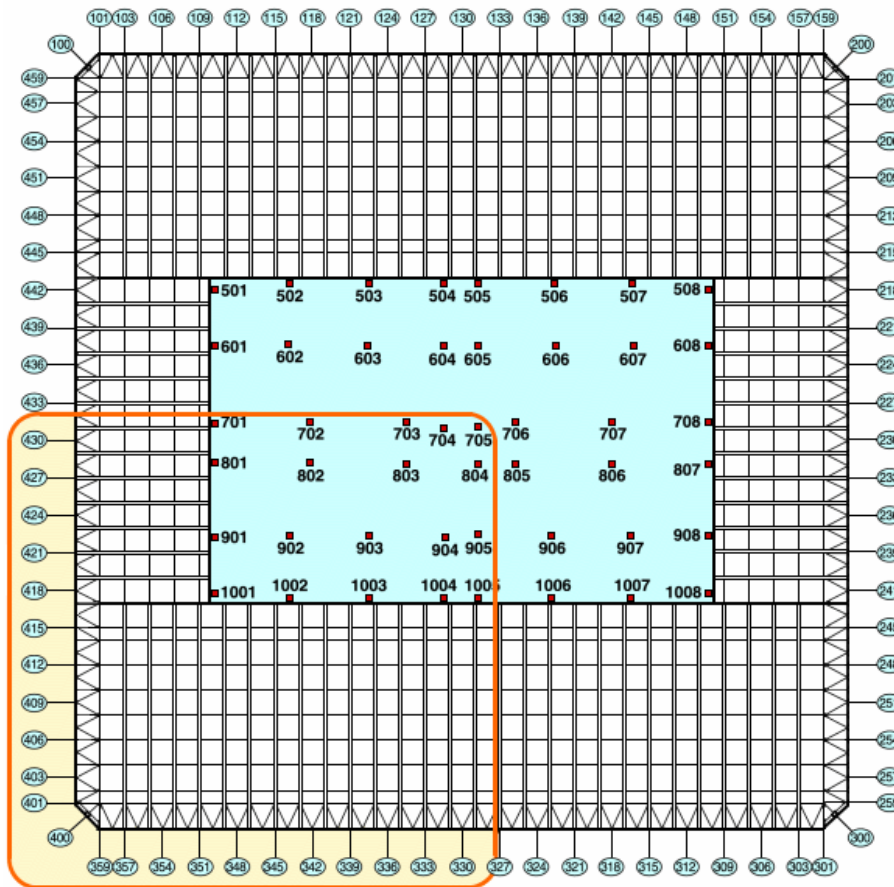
Representative structural framing plan, upper floors. FEMA report 2000
